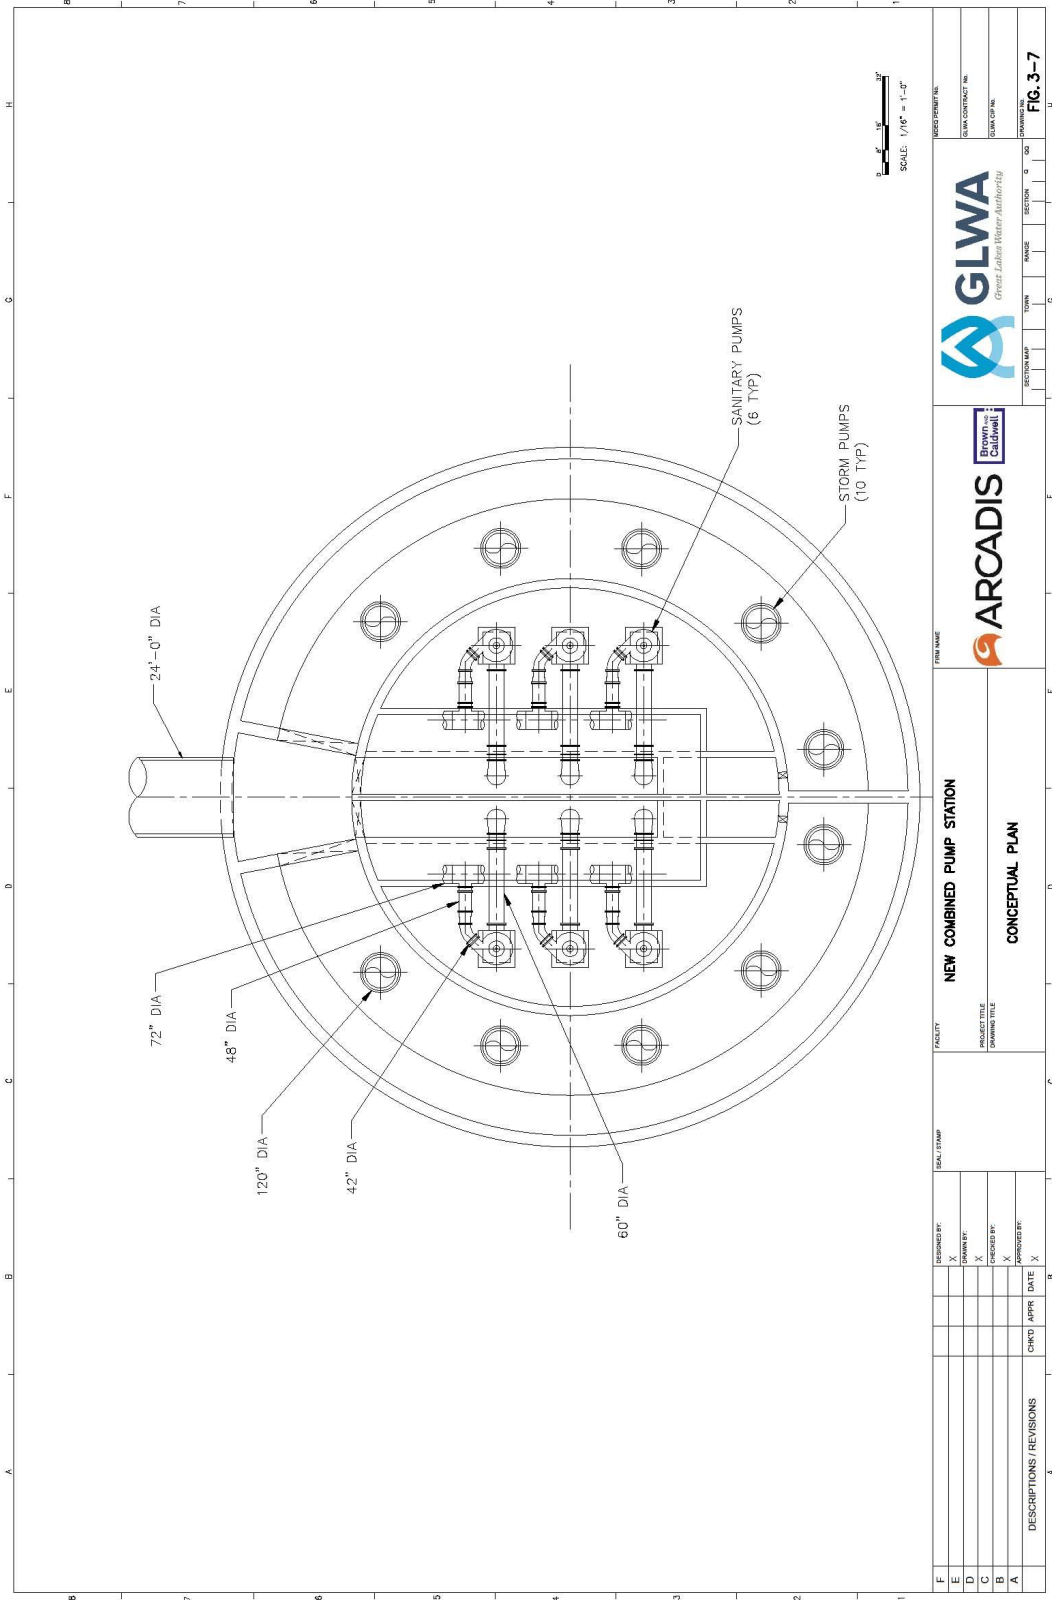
Alternative 3 - Combined Pump Station Pump Layout Plan
